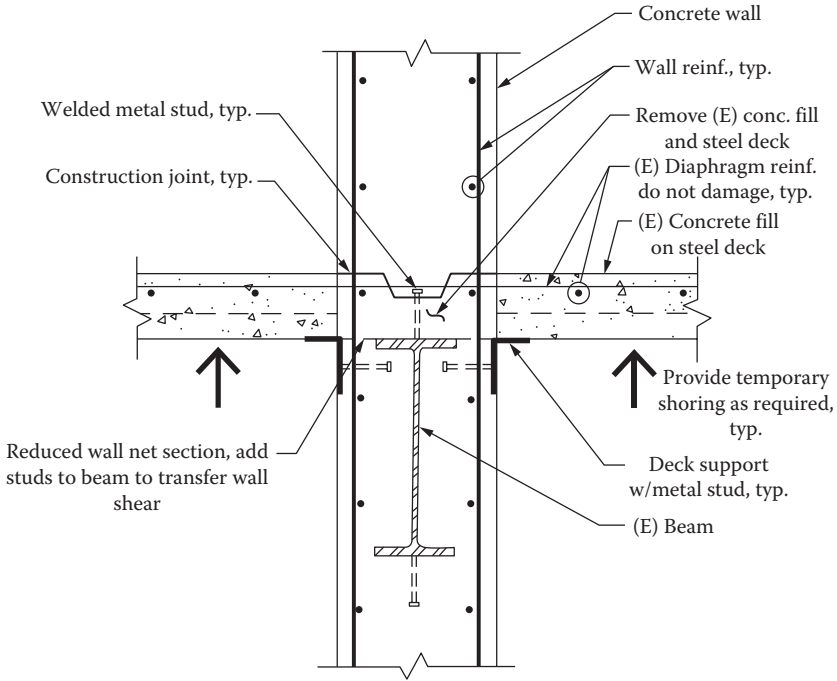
Cast-in-place concrete wall at existing beam. *Note:* Offset wall to one side of beam if additional room required for vibrating equipment or for shotcrete construction.
